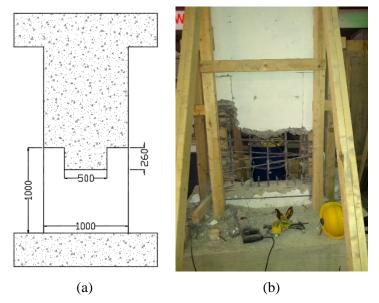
Extent of concrete removal: (a) Schematic drawing, and (b) Photo
